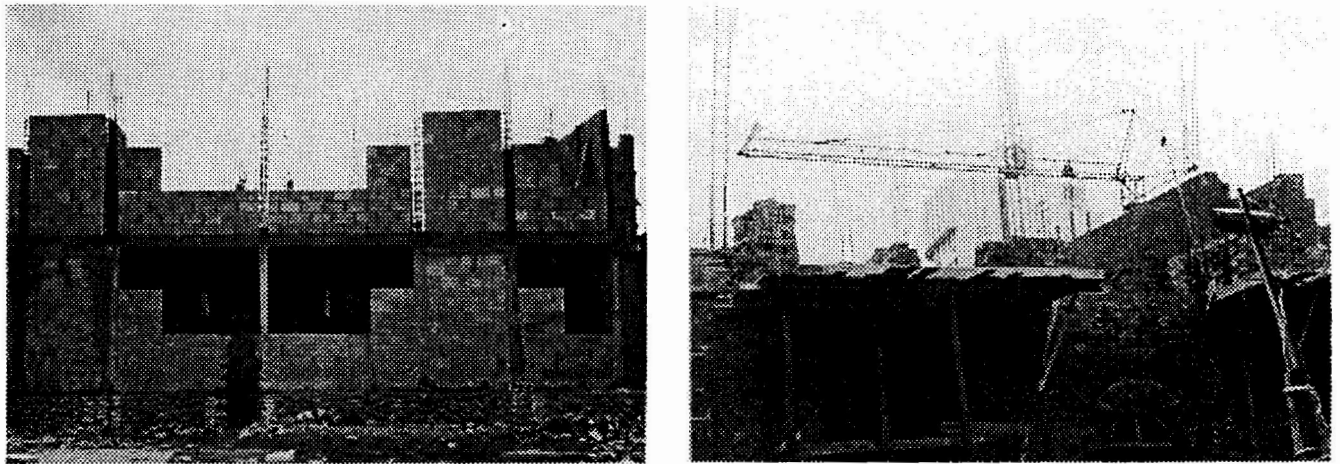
Confined concrete masonry walls (under construction in Mexico and P.R.of China)
